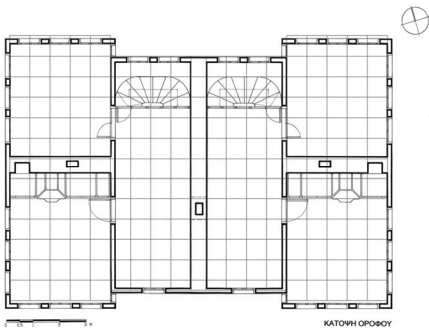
Upper storey plan of Anthopoulos Mansion in Florina
